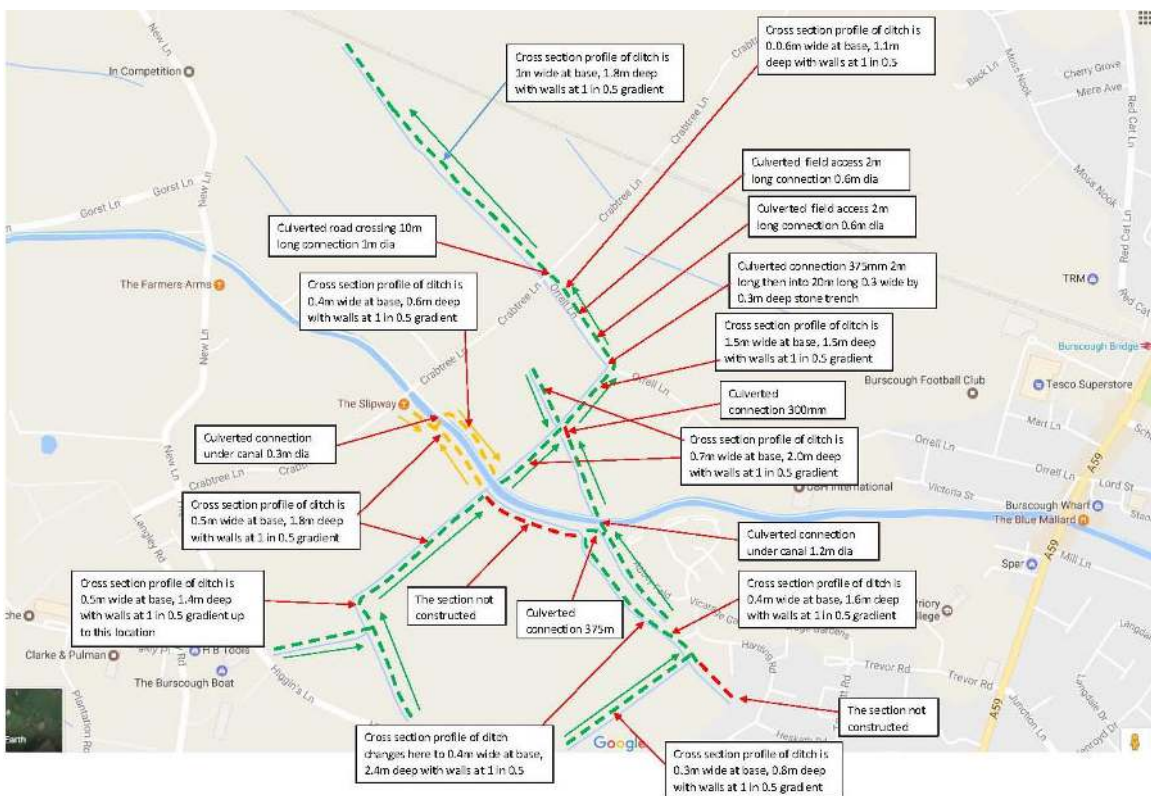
Site walkover details south of rail line and north of Higgins Lan
